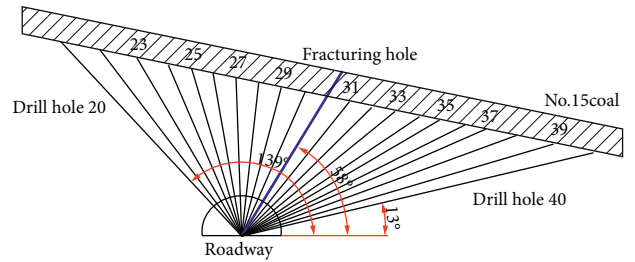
Sectional view of the observation hole number of the pressure holding hole.
